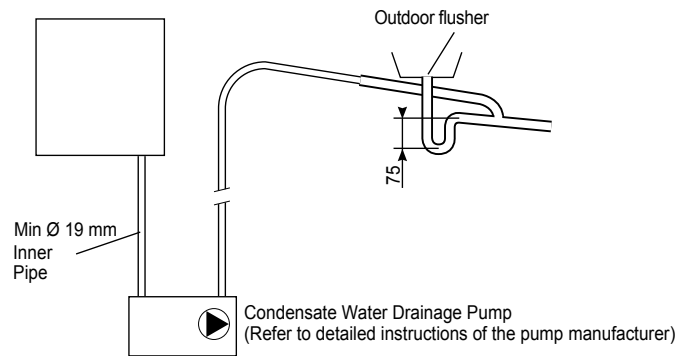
Typical Connection Method of a Condensate Water Drainage Pipe (refer to detailed instructions of the pump manufacturer)
